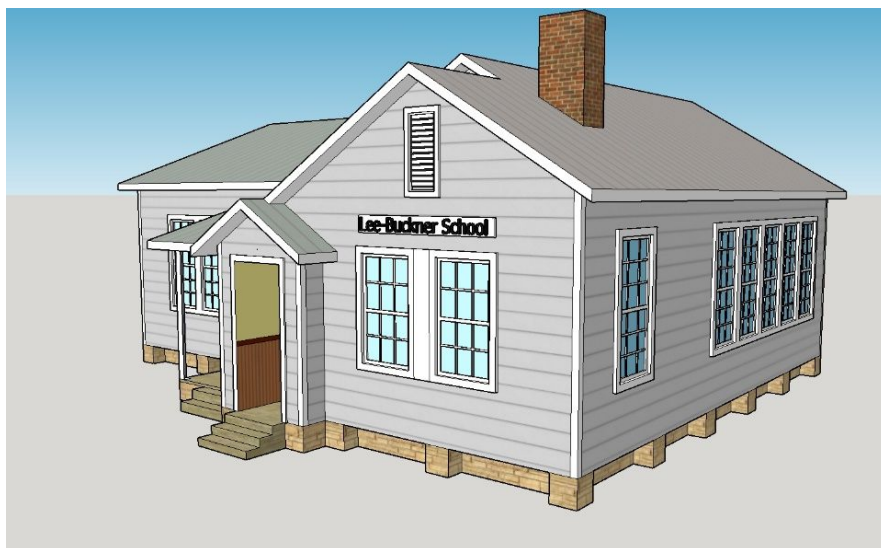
2023 South elevation of Lee-Buckner School building, 2020.
